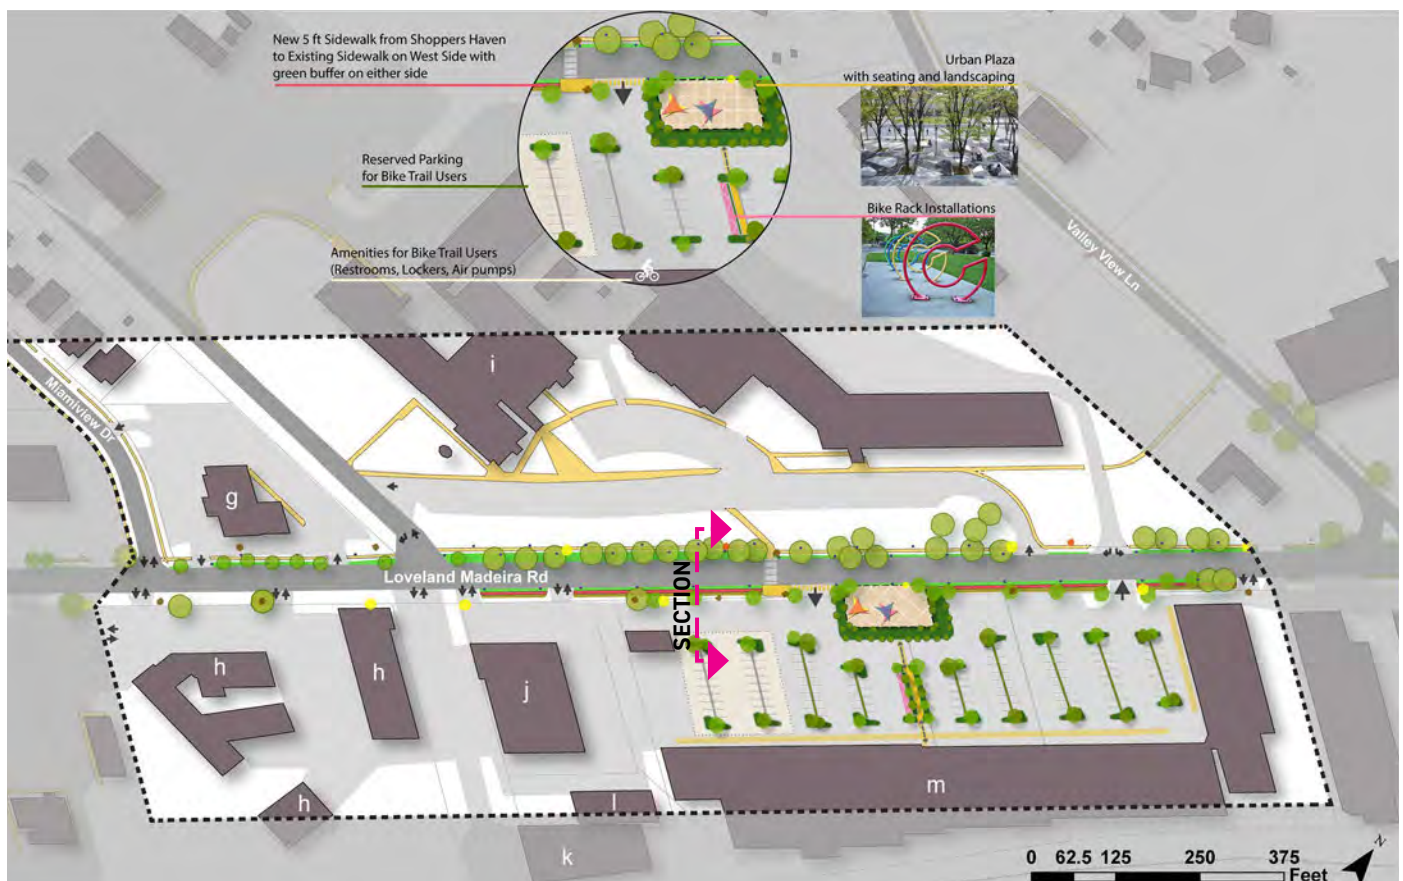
of corridor from Miami View to past Shoppers Haven \* building index on pg. 39
